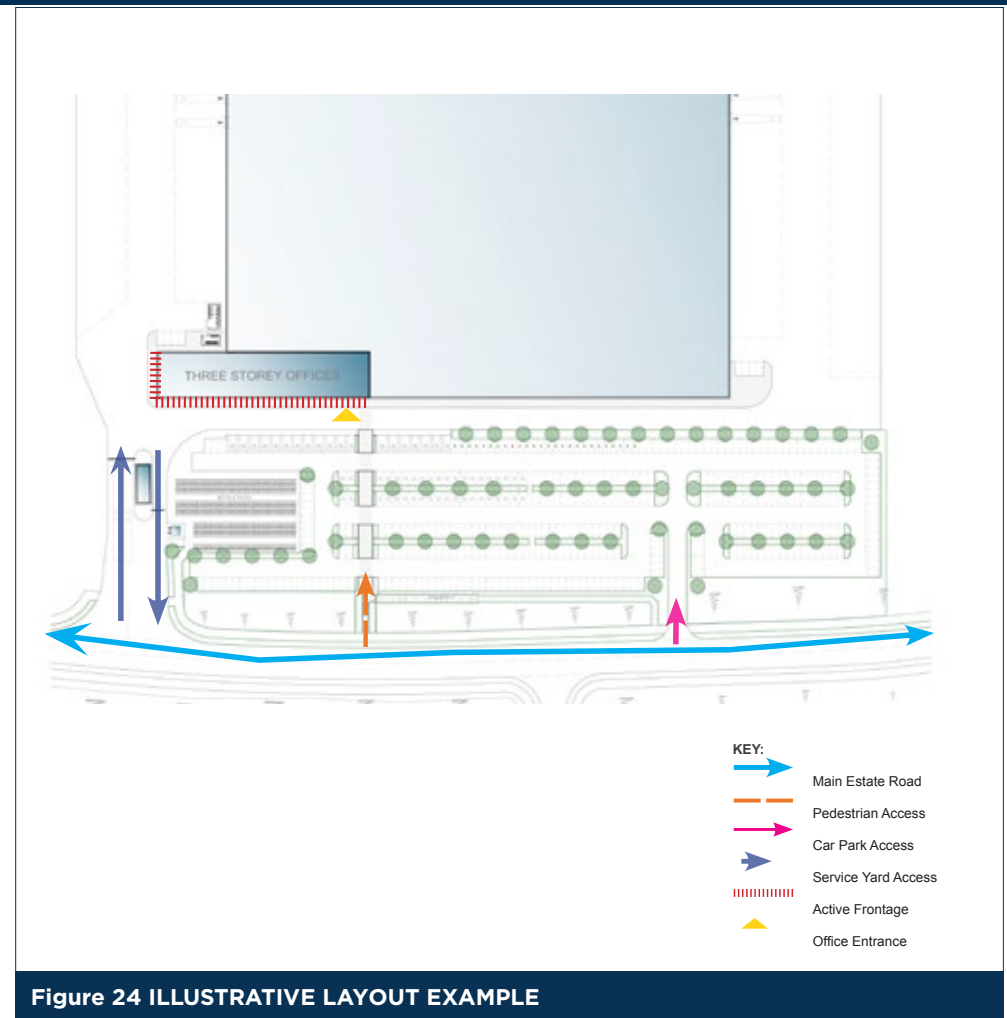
ILLUSTRATIVE LAYOUT EXAMPLE
